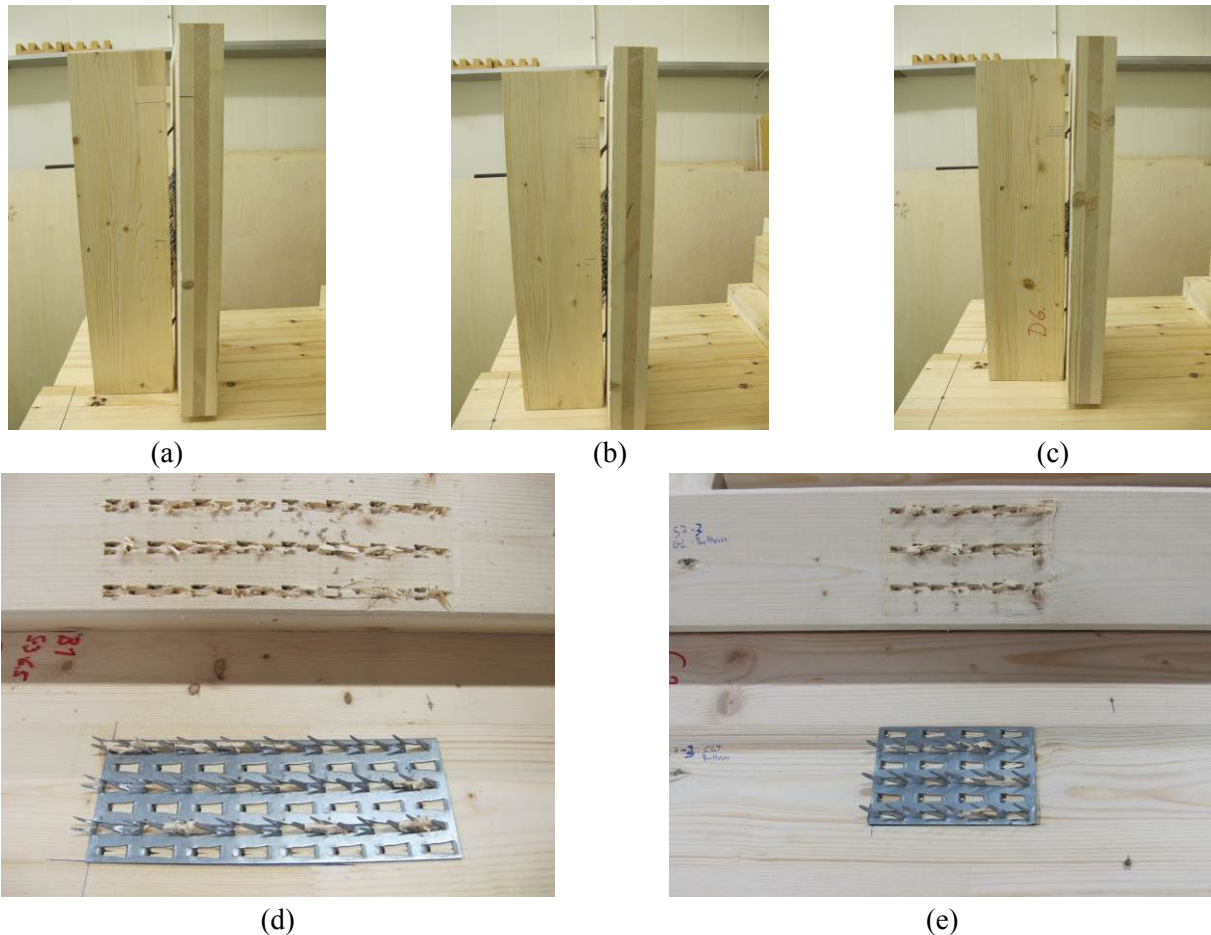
Specimens with combined screw and double-sided nail plates after failure, (a) and (d) S3, (b) S4, (c) and (e) S7
